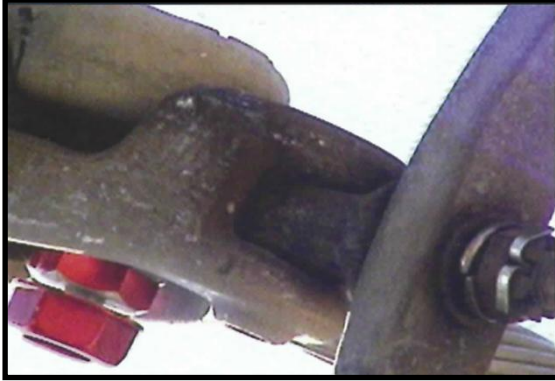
The Structural Condition of Spacers Confirmed in Detail with On-Board Camera [19]
